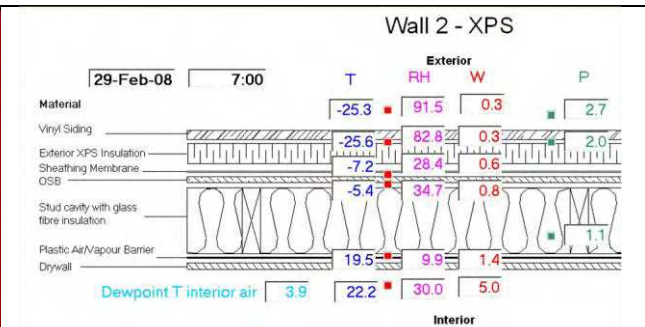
Configuration A2: Snapshot of Wall 2 cross-section (coldest outdoor temperature)
